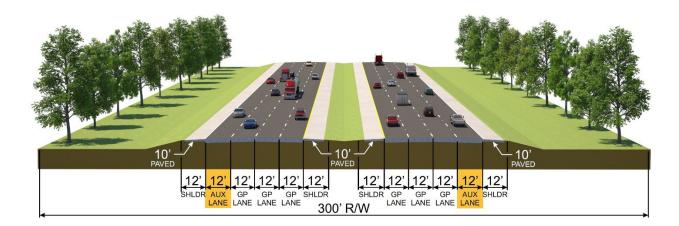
| Auxiliary Lanes Alternative Typical Section
